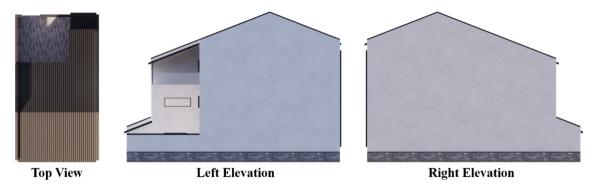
The Top View, Left Elevation and Right Elevation of Sample Building No. 1 (Drawn by the author)
